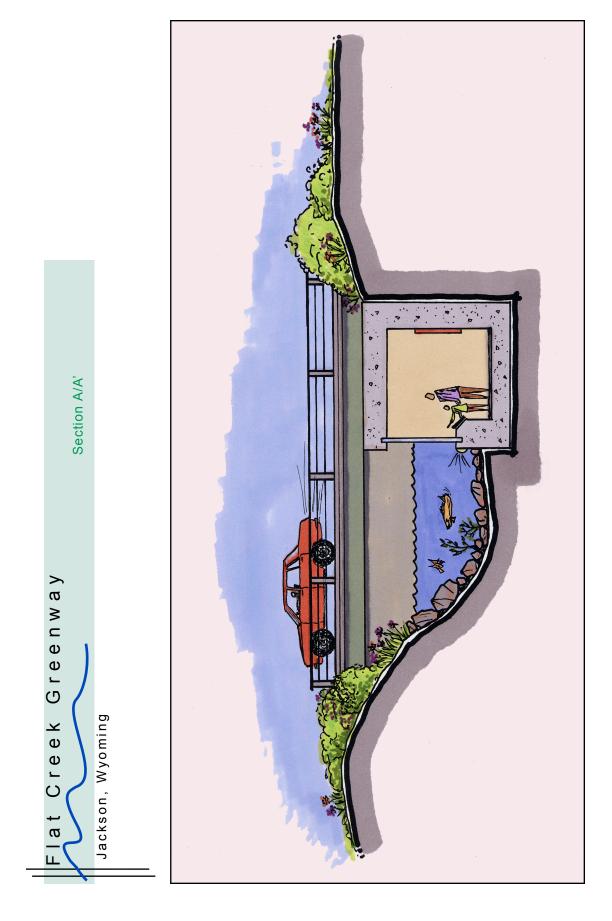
Section/elevation showing the Ed Benson Trout Viewing Window below Broadway Avenue
